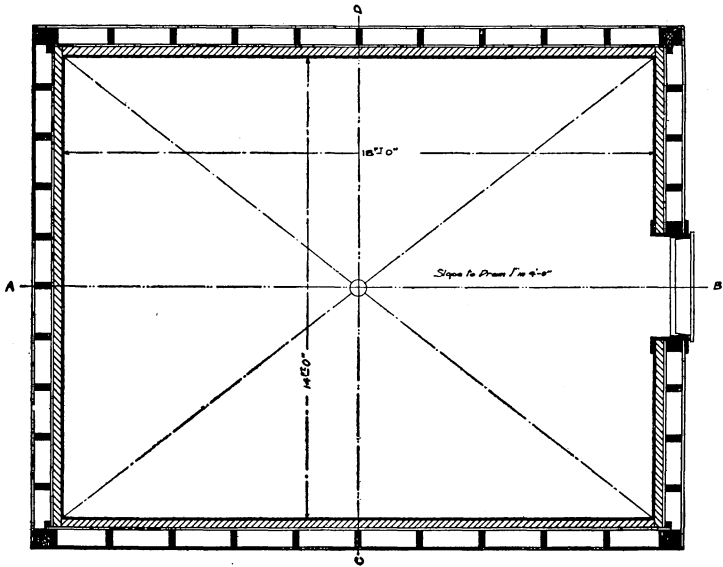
Framed ice house with commercial insulation. (Ground plan.)
